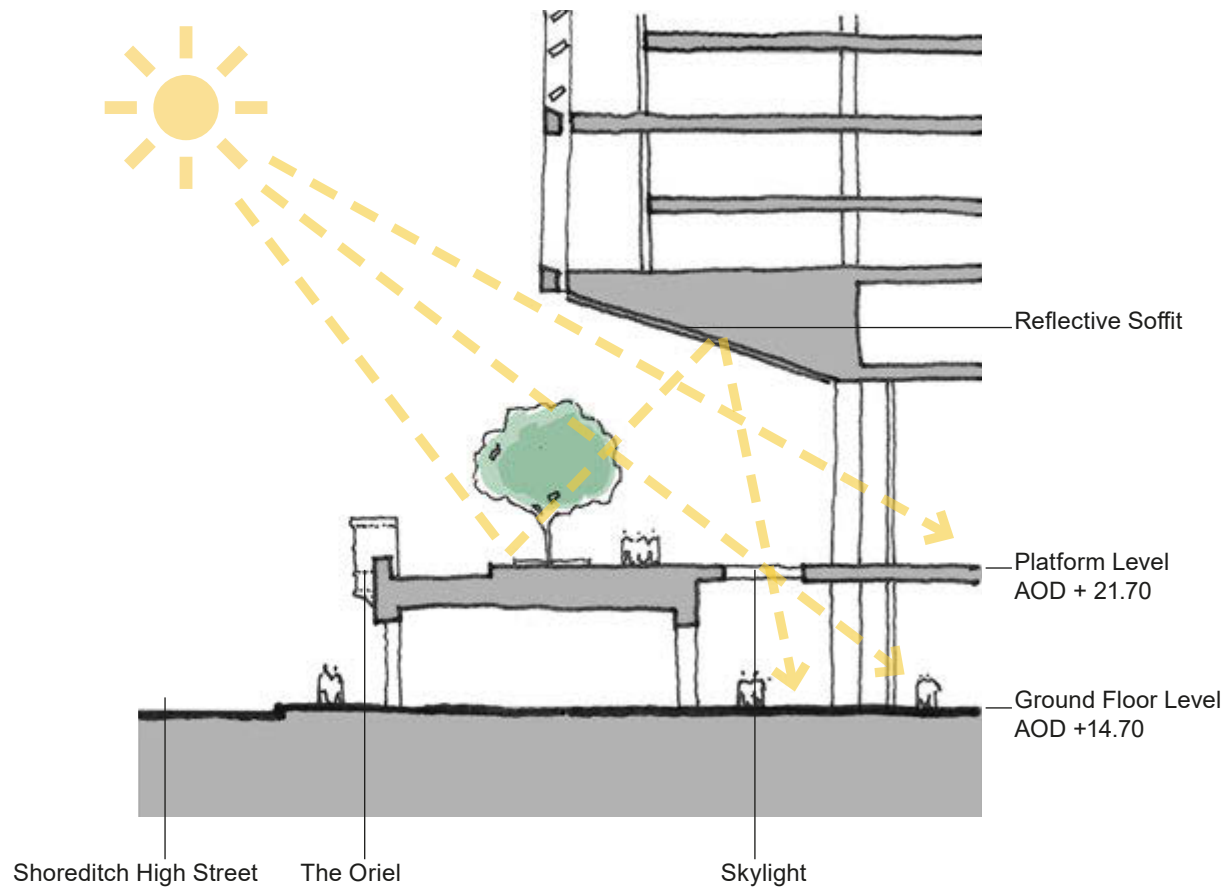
The Building Prow and the Platform - Section showing the landscaped Platform between The Oriel and Building 2
